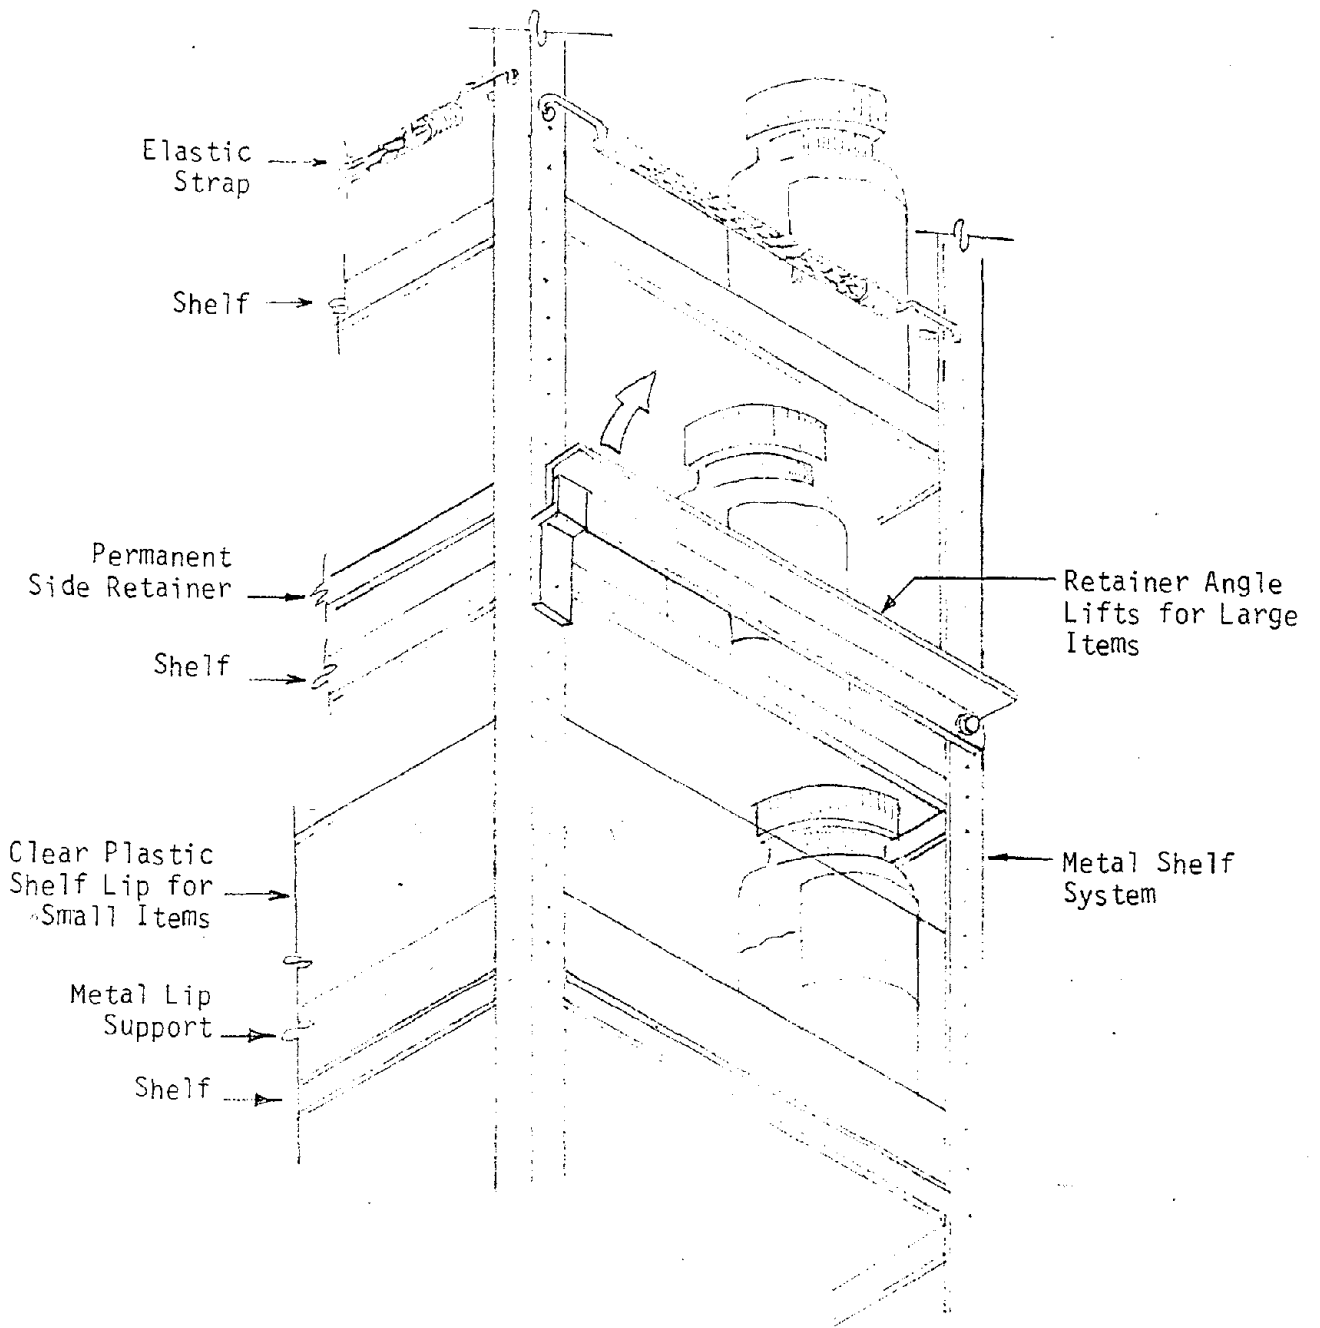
Typical Shelved Item Retainer Systems. (71)
